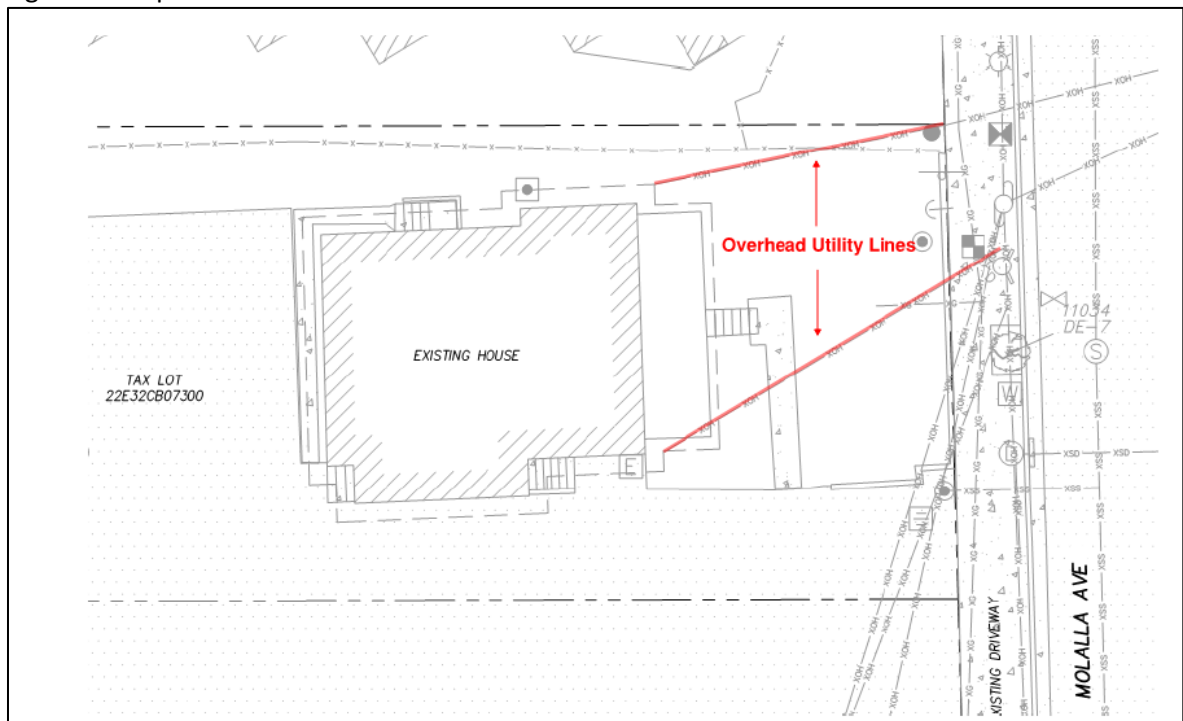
Utility Lines Required to be Undergrounded by Condition of Approval from Prior Review
